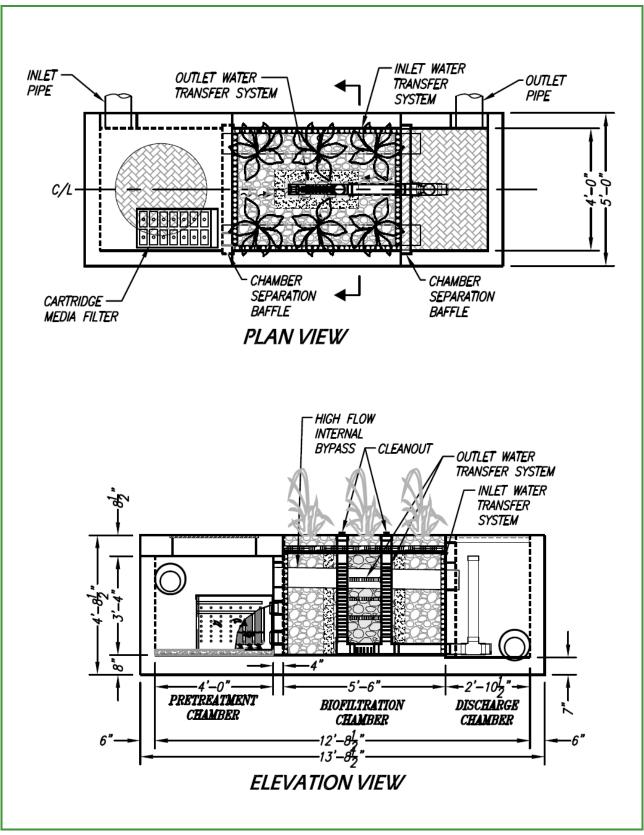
Design Details of Half Size MWS-Linear system with Piped Inlet Flow.
